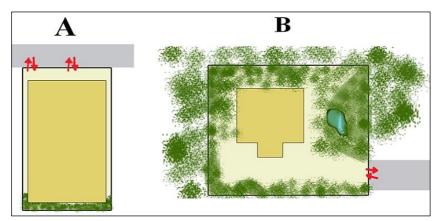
Individual House Site Plan: (A) Full Height Window Villa, (B) Courtyard with a Greenery View
